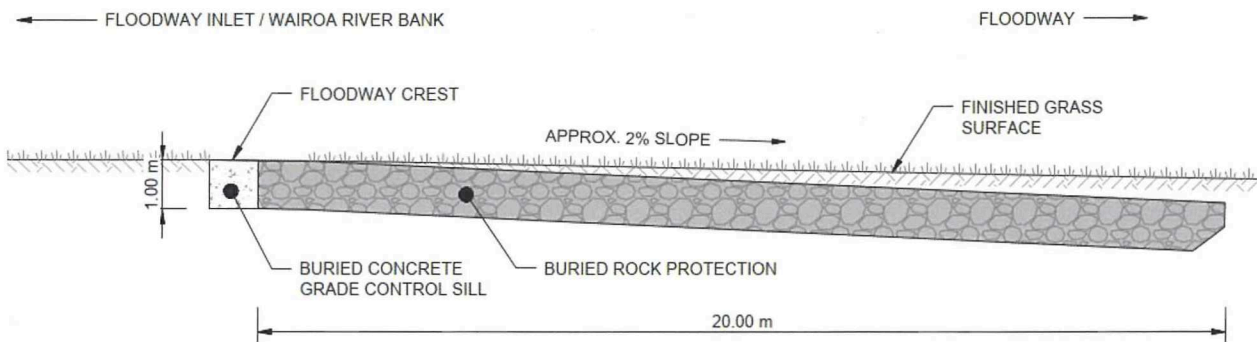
Proposed buried concrete grade control sill setback from floodway inlet
